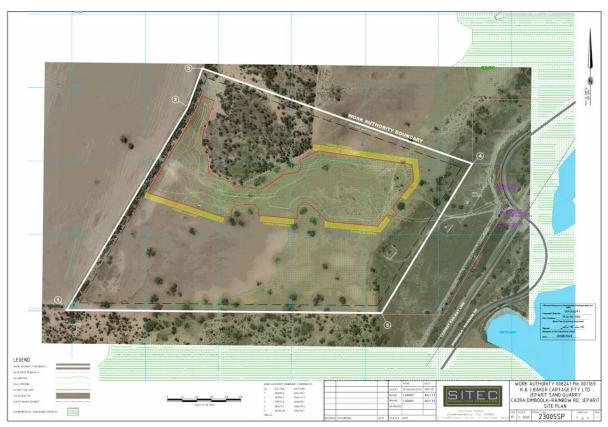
Endorsed Site Plan in WA008241 Work Plan showing extraction area details
